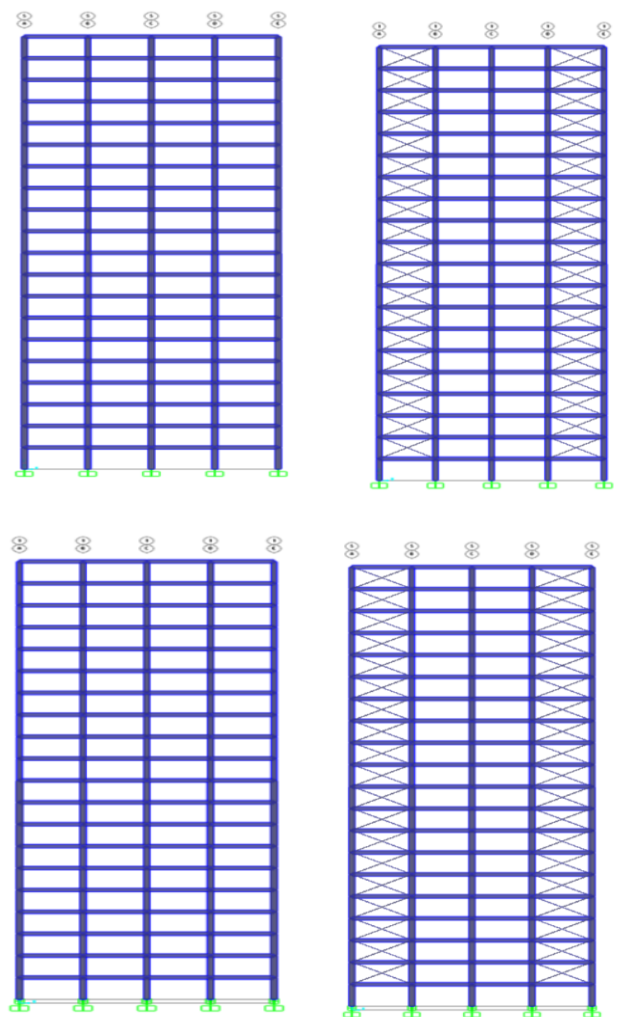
elevation of 20 storey structure fixed base, braced fixed base, base isolated and braced base isolated structure
